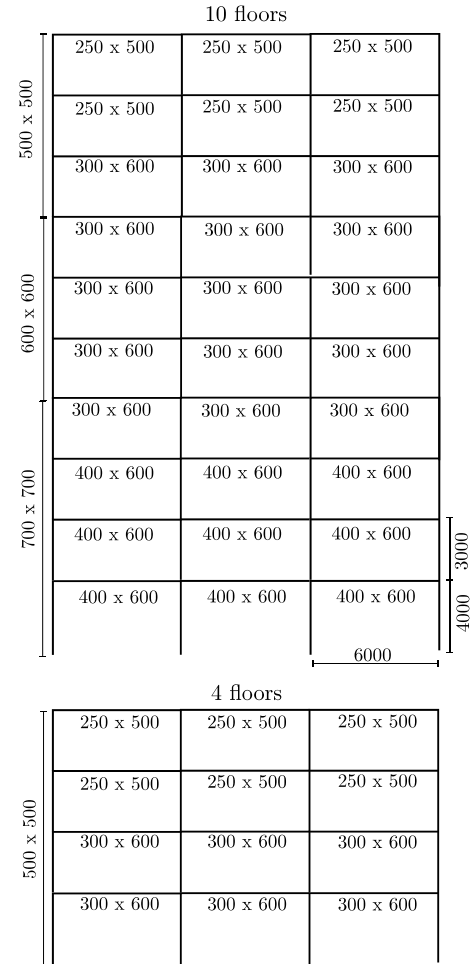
Elevation view of the two RC frames considered in the present study (4 and 10 floors). (Units: mm).
